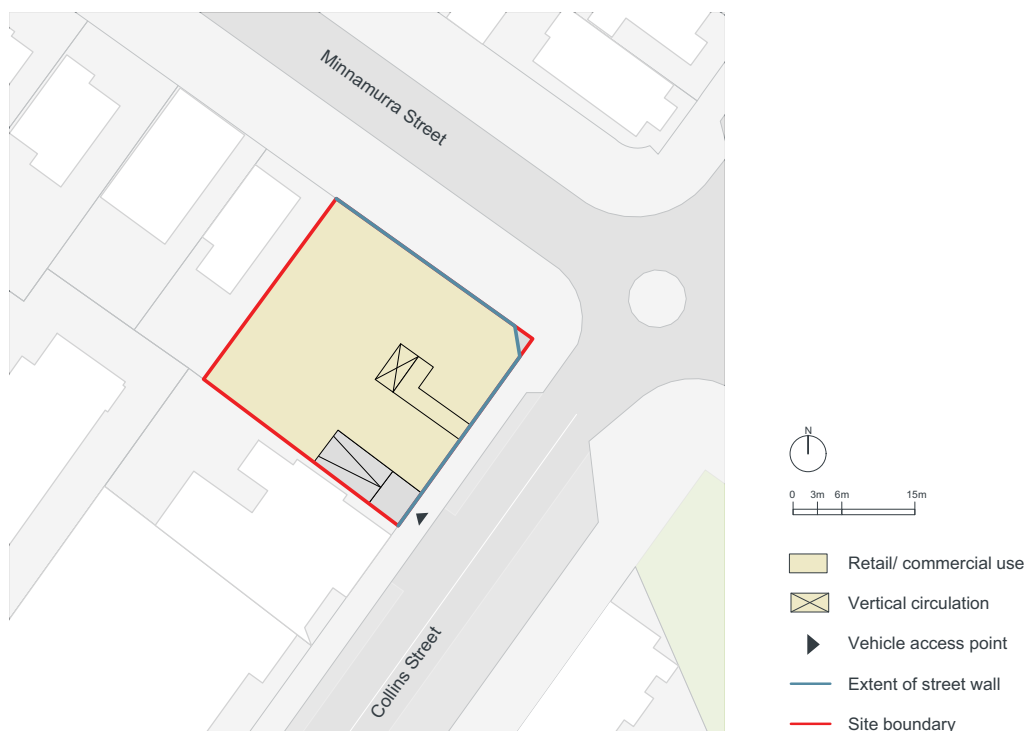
Corner site at Minnamurra & Collins St - Ground Level Plan
